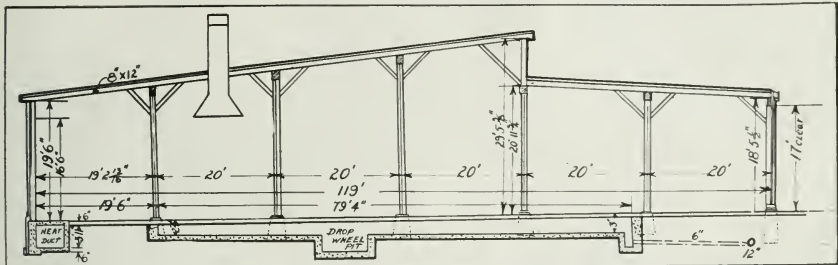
Cross section through drop wheel pit stall, Canadian National Railways, Locomotive House, Moncton, N.B.
